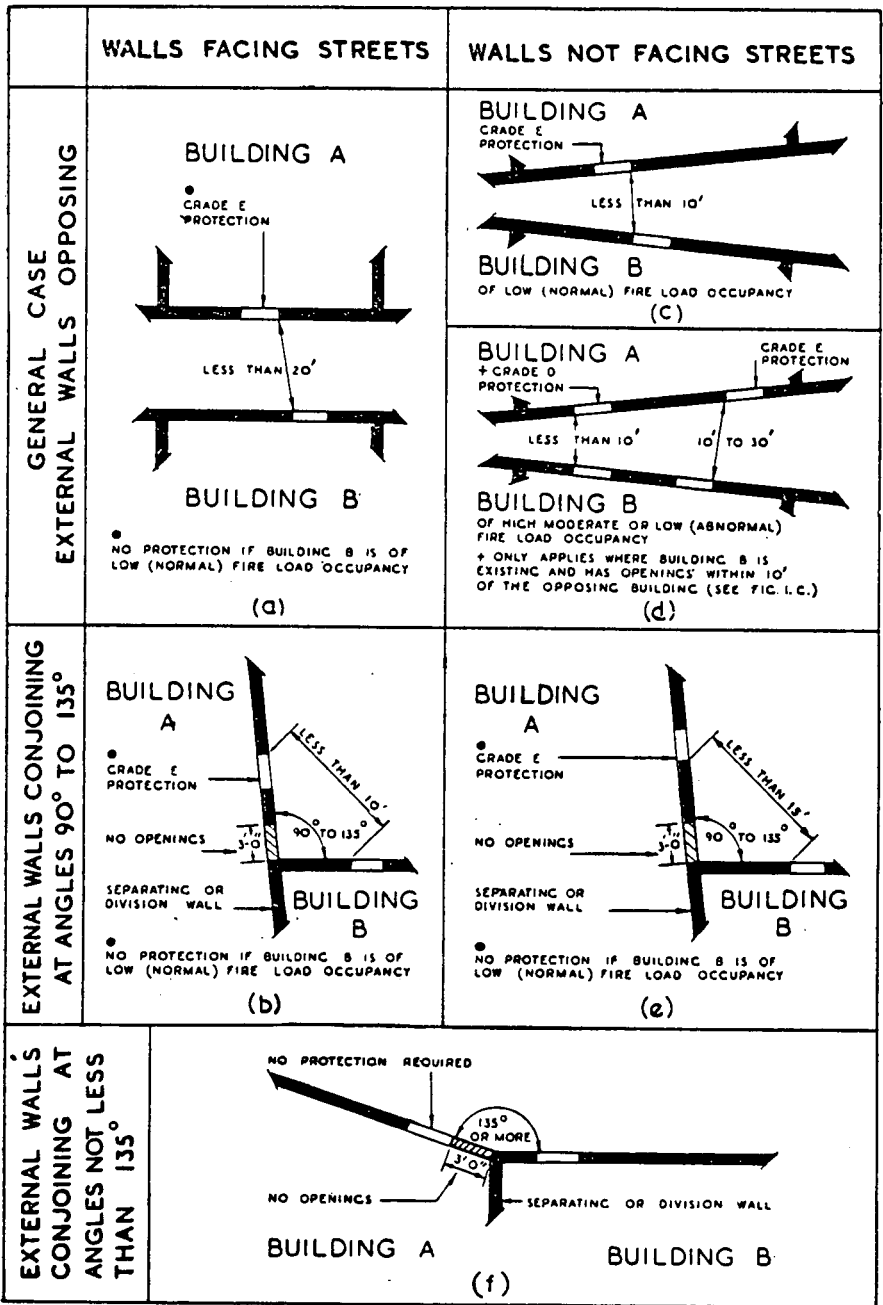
PROTECTION OF OPENINGS IN EXTERNAL WALLS BUILDINGS (OR DIVISIONS) OF LOW (NORMAL) FIRE LOAD OCCUPANCY
